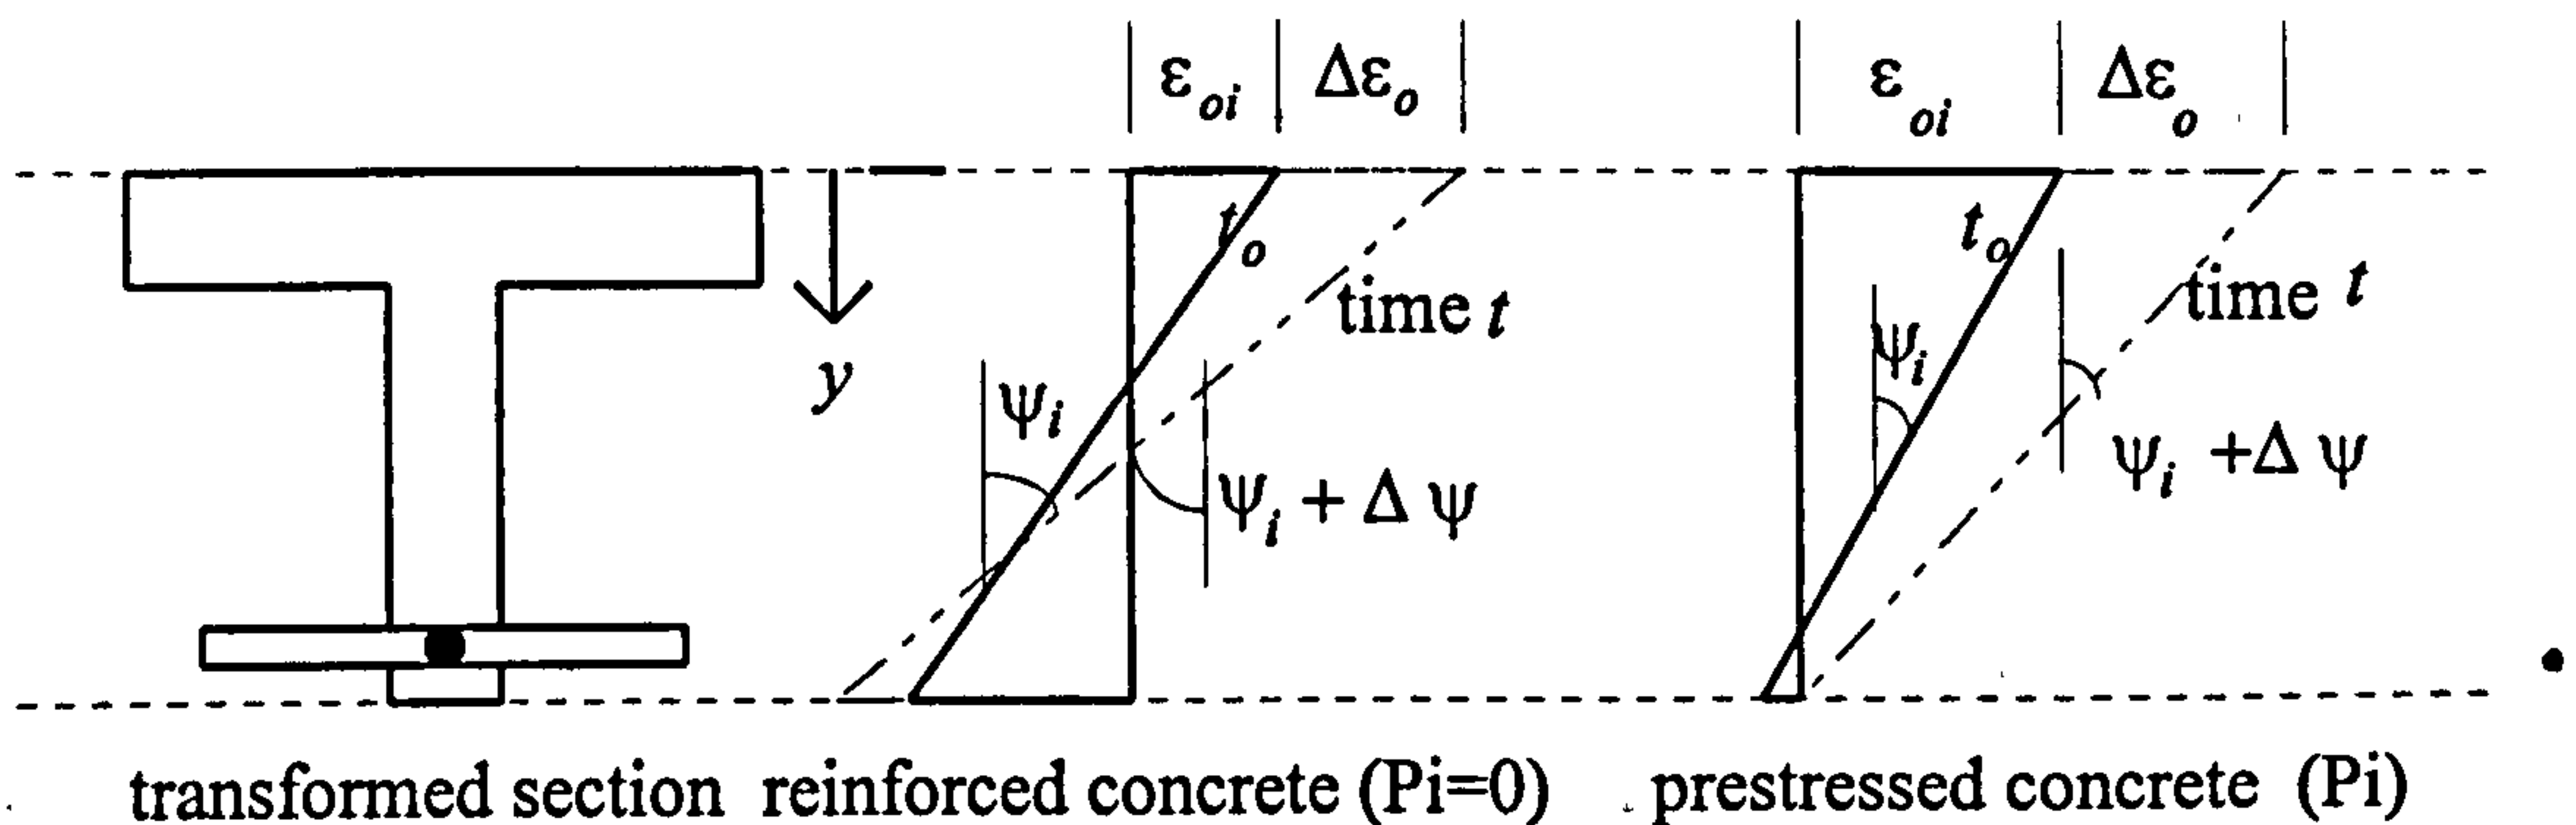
Time-dependent deformations for reinforced and prestressed concrete sections
